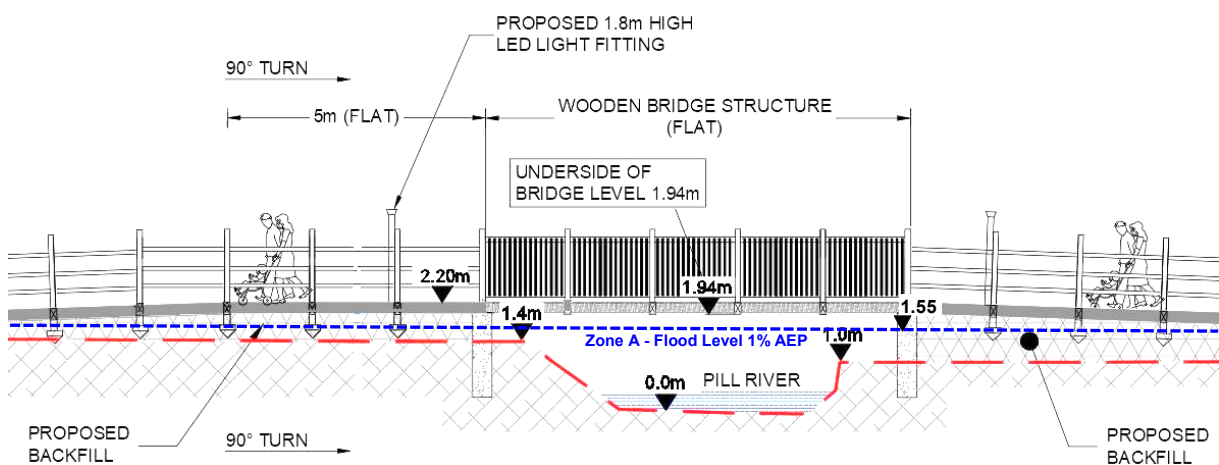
Proposed bridge section at chainage 4+472 (Pill River Bridge Crossing-2)
